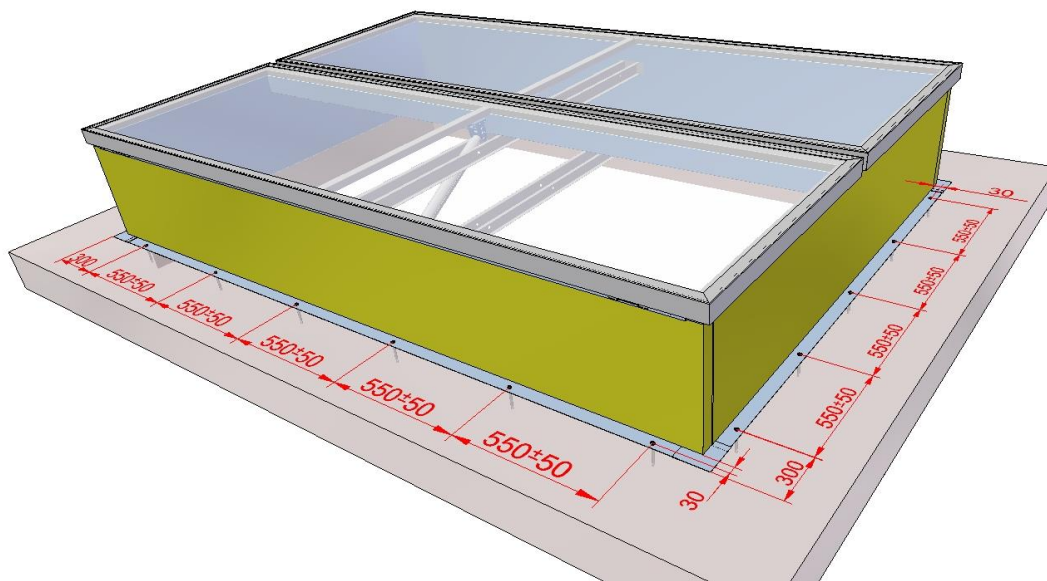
Method of mcr-PROLIGHT DVP positioning on the roof - fixtures spacing
